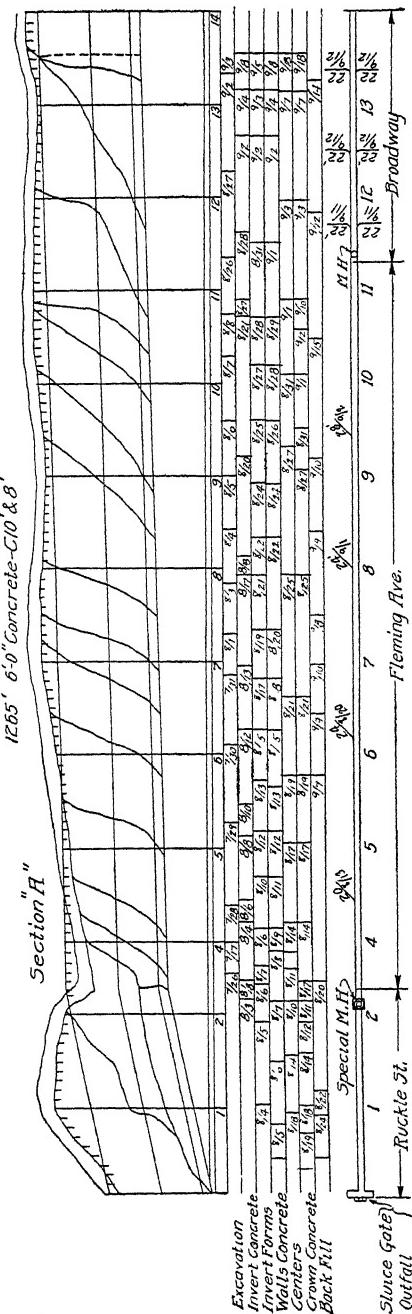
Detailed Progress Chart for Concrete Sewer Show as Section A in Fig. 8
